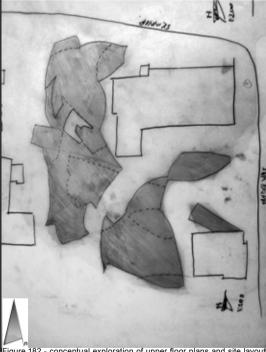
conceptual exploration of upper floor plans and site layout for both new proposed buildings.
